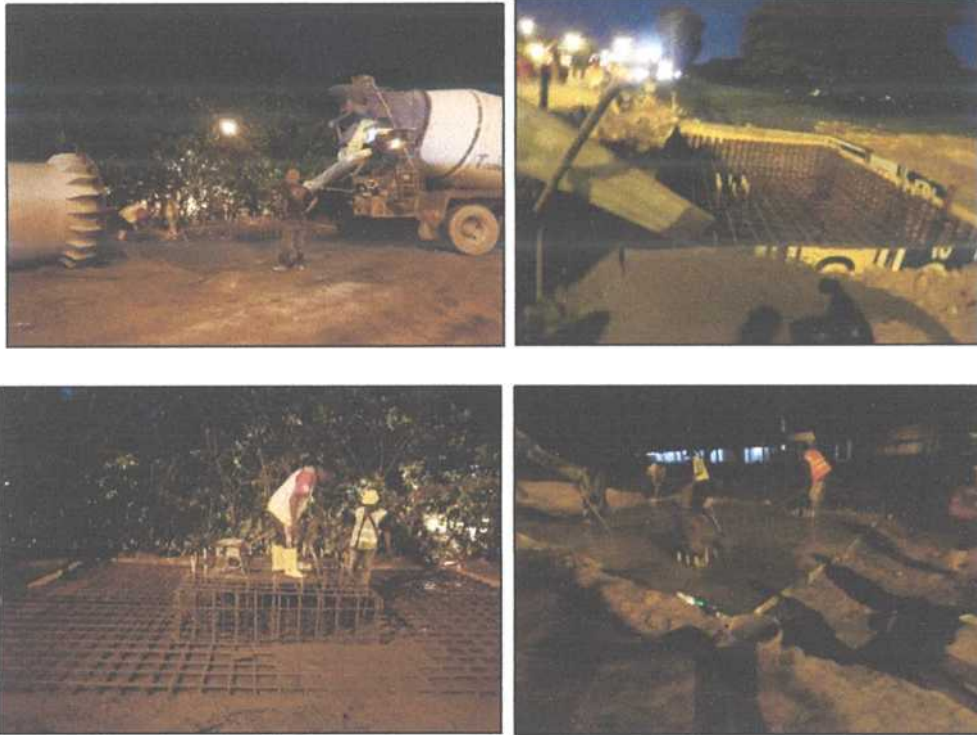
Concreting Works (Courtesy of FE Sdn Bhd)
